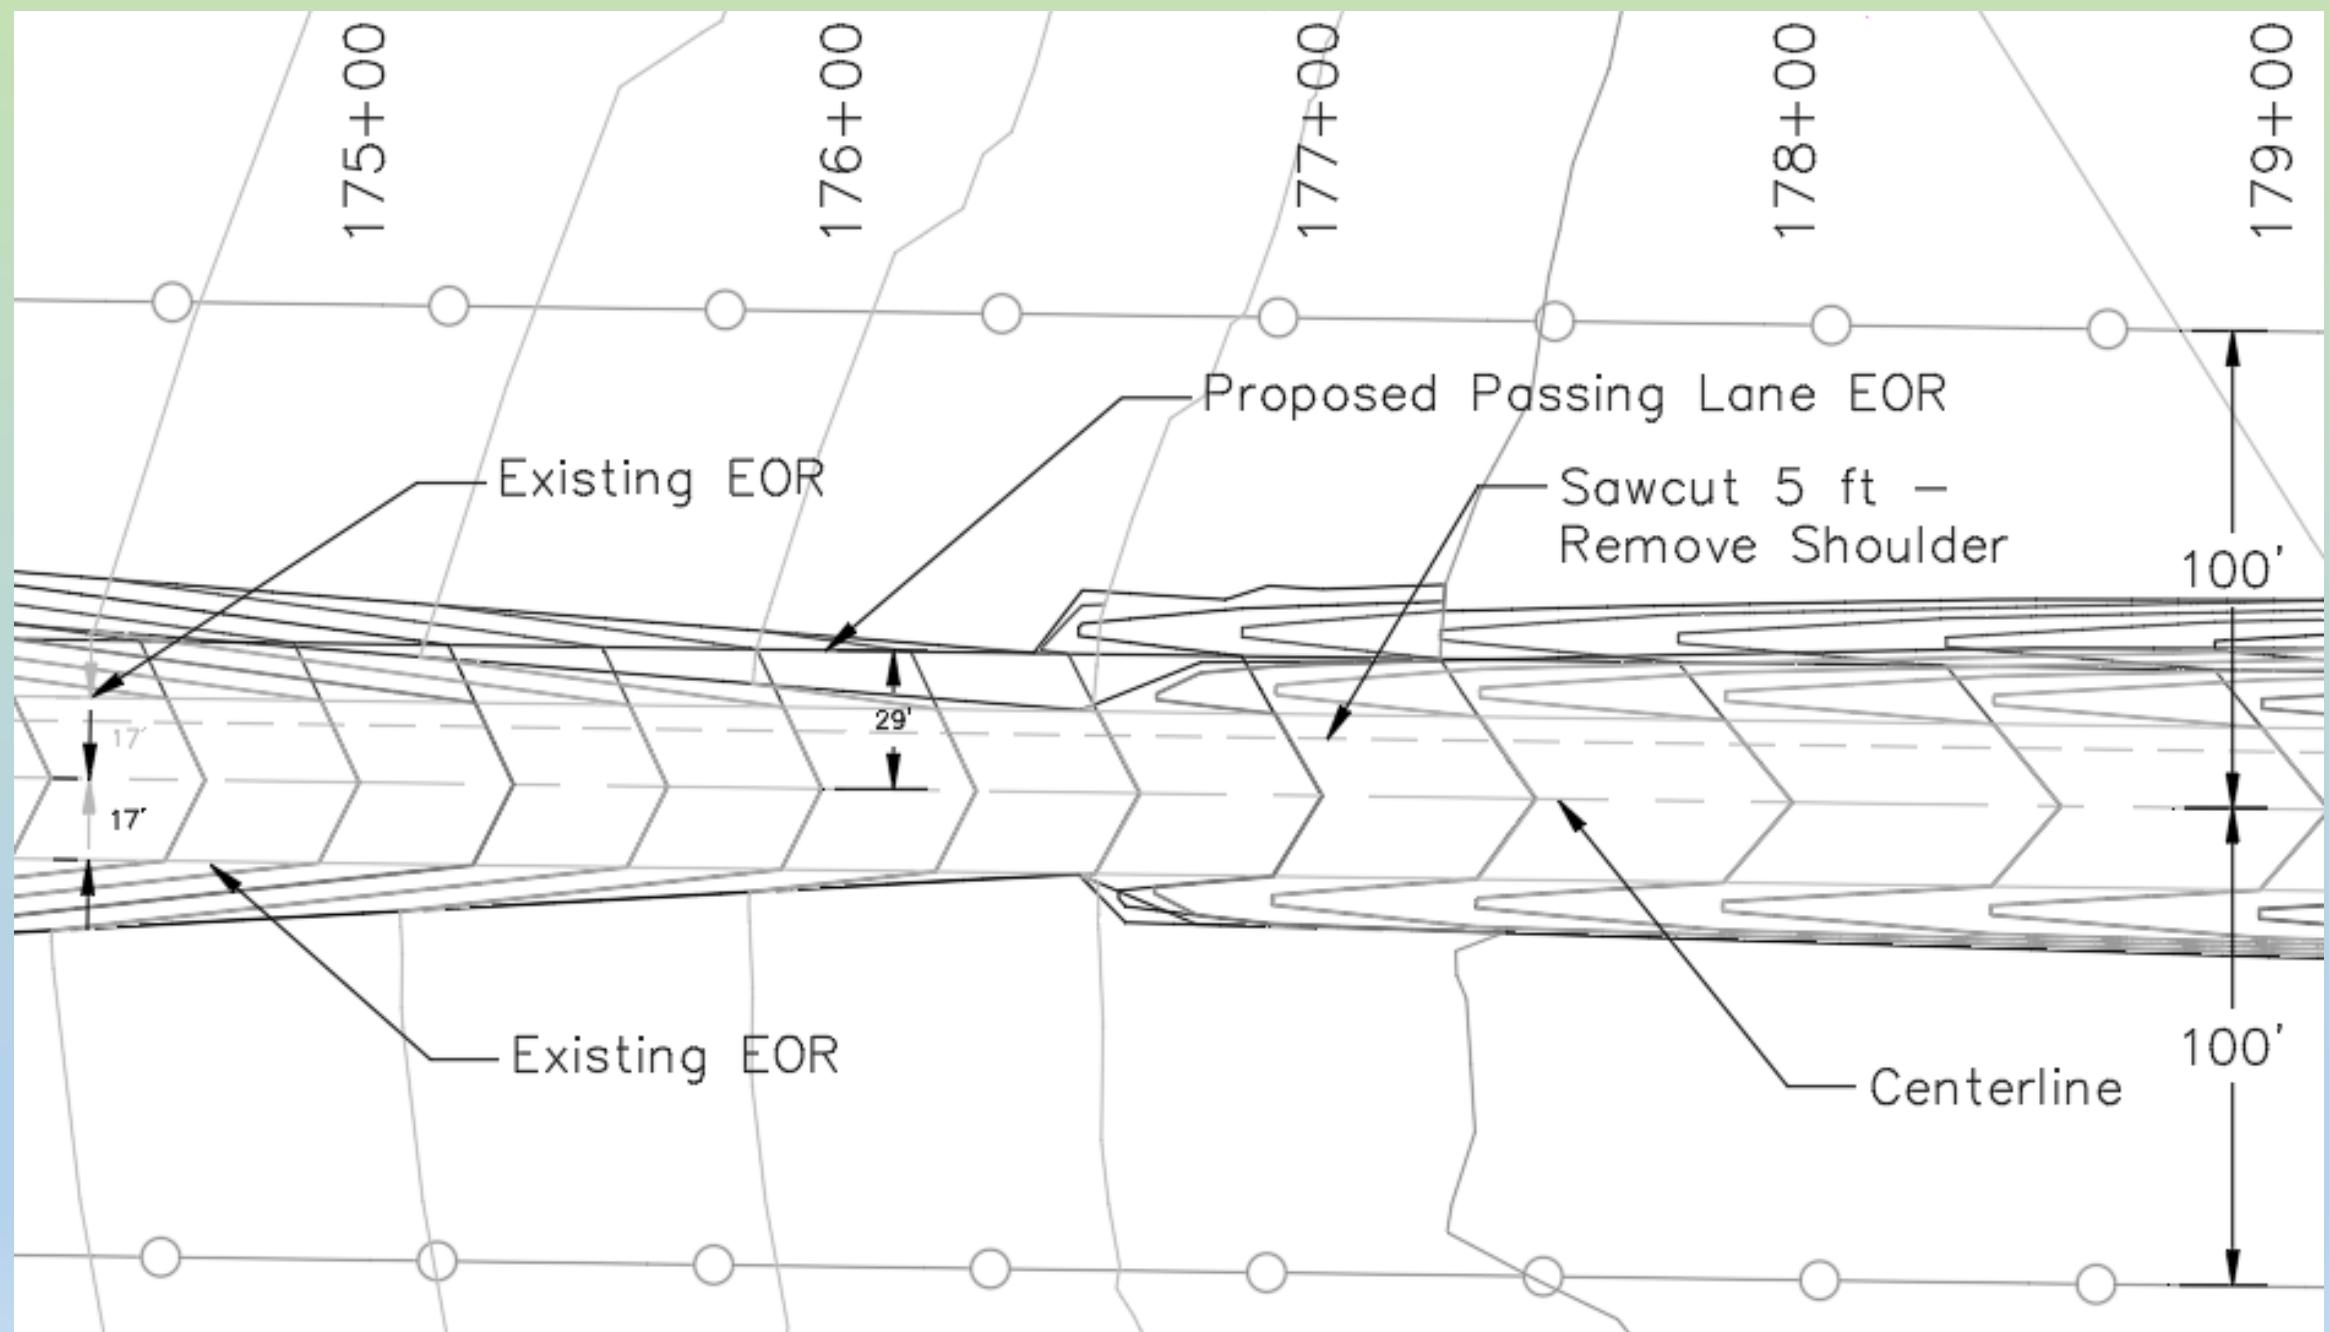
Plan and Profile Sheet Sta. 168+50-180+50 [7]
